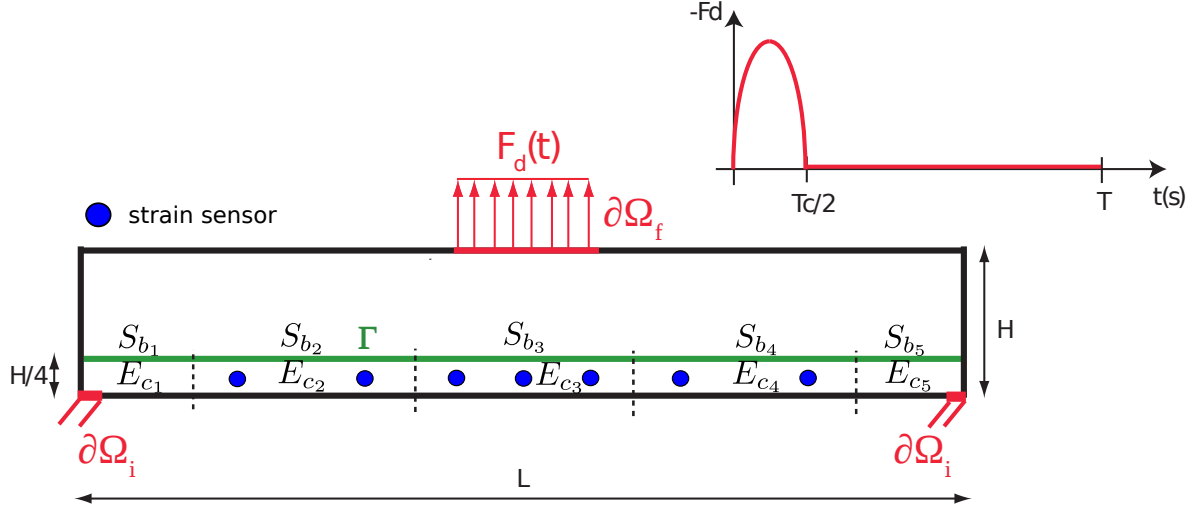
Concrete beam with a horizontal steel bar - Steel bar decomposed in 5 pieces. Each piece has a constant cross-section - Lower Concrete part decomposed in 5 subdomains. Each subdomain has a constant Young modulus - Beam instrumented with 7 strains sensors.
